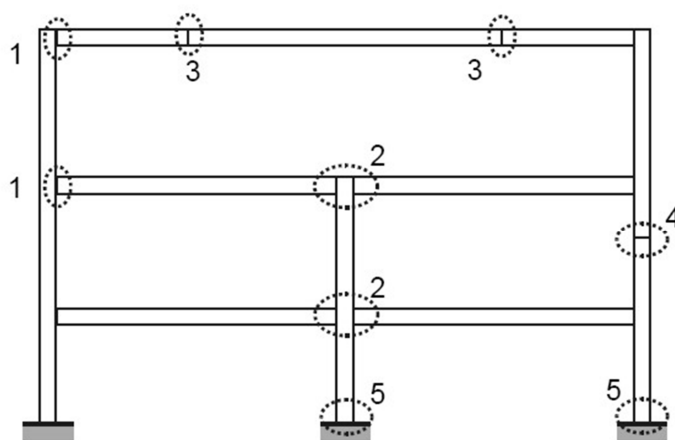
Structural Joints Configuration (CEN, 2005)
